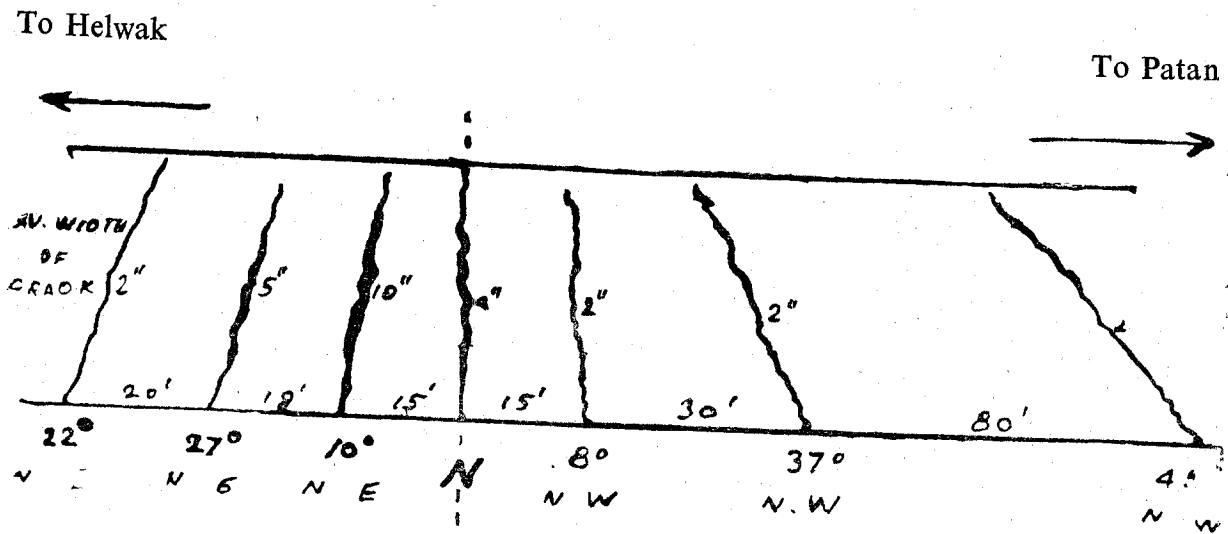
Radial Cracks on Guhagar Karad Road at Mile 55/1.
